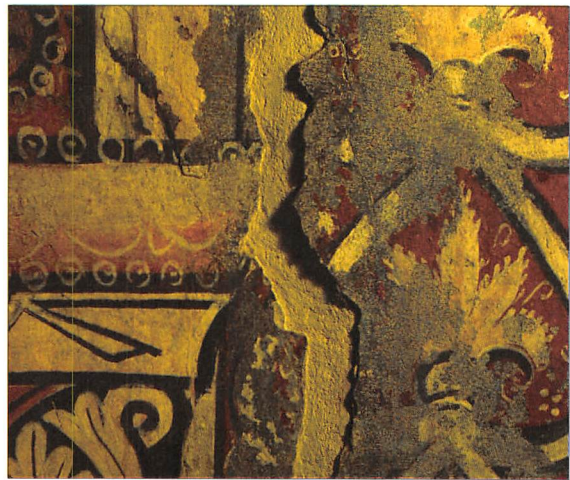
Crack separating the limestone arch from the rest of the baked brick structure. Photo: Ricchi.
